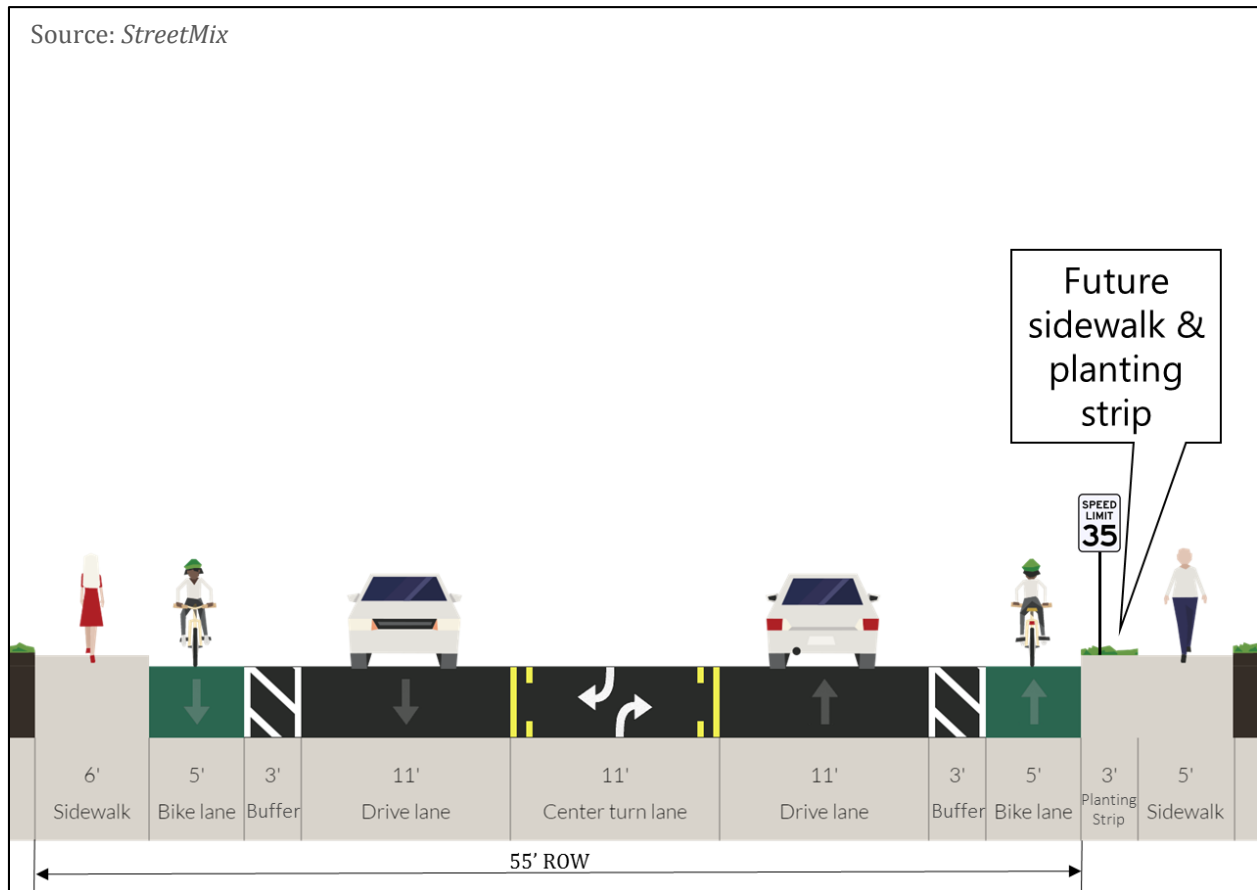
SR 28 Roadway Typical Section - 55' ROW
